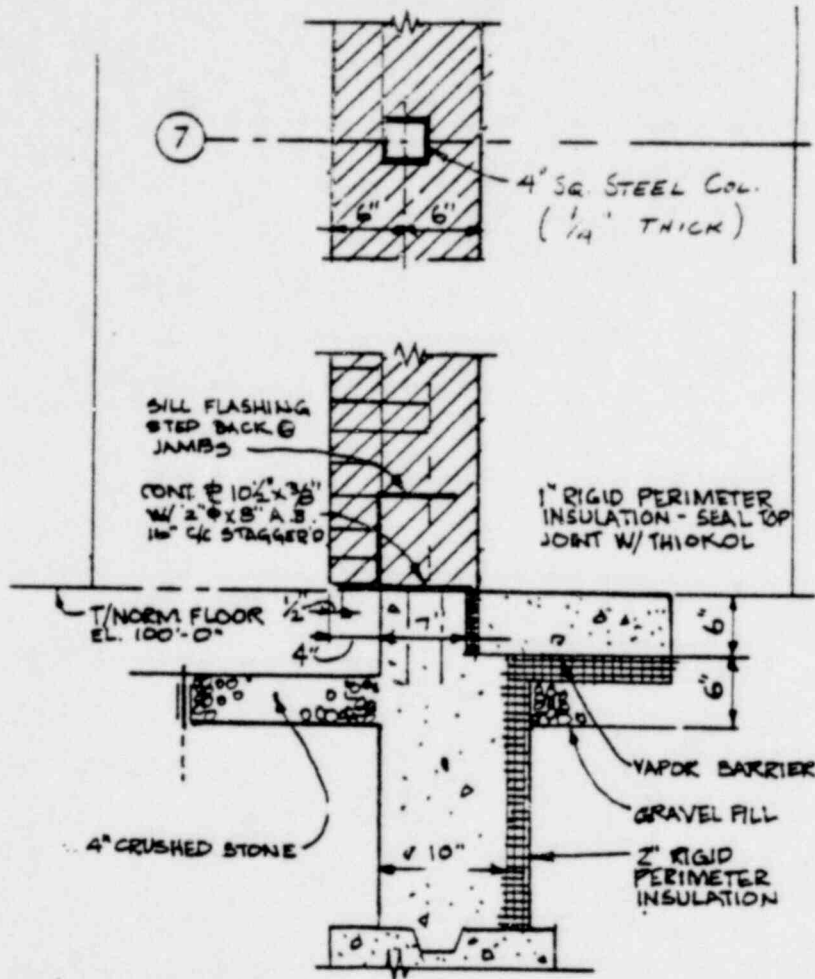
JN-4 TYPICAL EXTERIOR WALL SECTION
